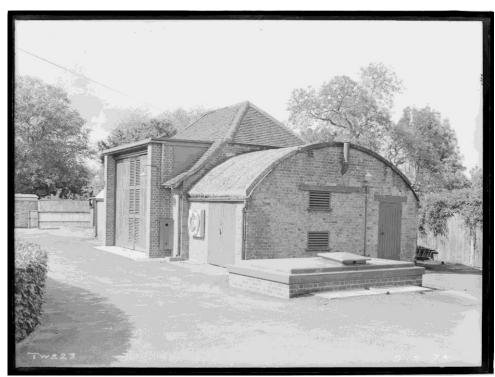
Generator Building 1974. Front elevation shown as full height doors. Upper louvre with lintel on side elevation (Bottom louvre and door only present at current day).
